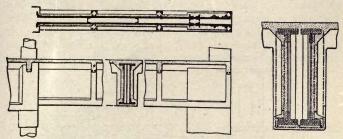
Fireproofing of Box Girder and Twin Girder.
